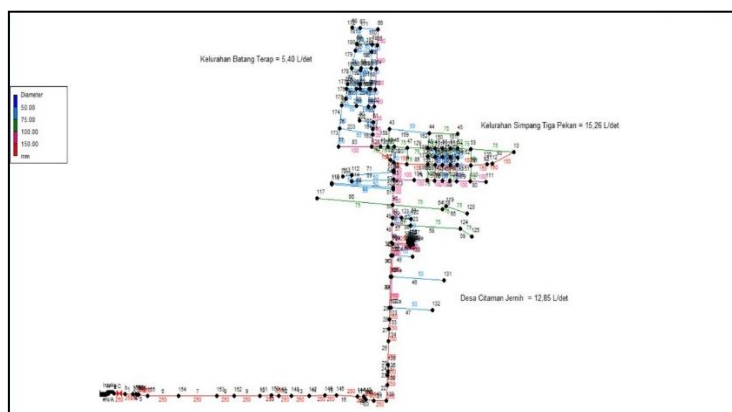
Service planning phase I (Source: BPS Serdang Berdagai, 2021)
